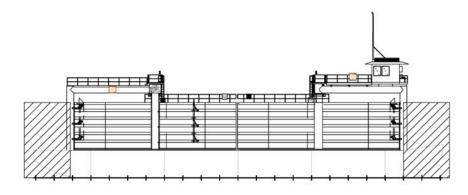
Nash Bridges or RE Staite with Connection Slough Gate
